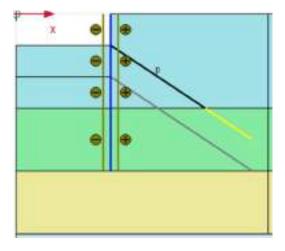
Phase 2, activation of the anchor and geotextile (grouting). Pre-stressing of the anchor to a value of 300 kN/m.
